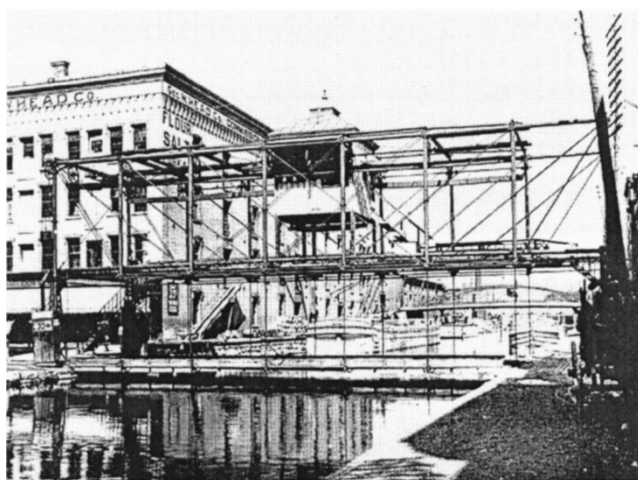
Hotel Street Bridge in Utica, New York (Source: Griggs, 'Development of the Vertical Lift Bridge', p 646)
